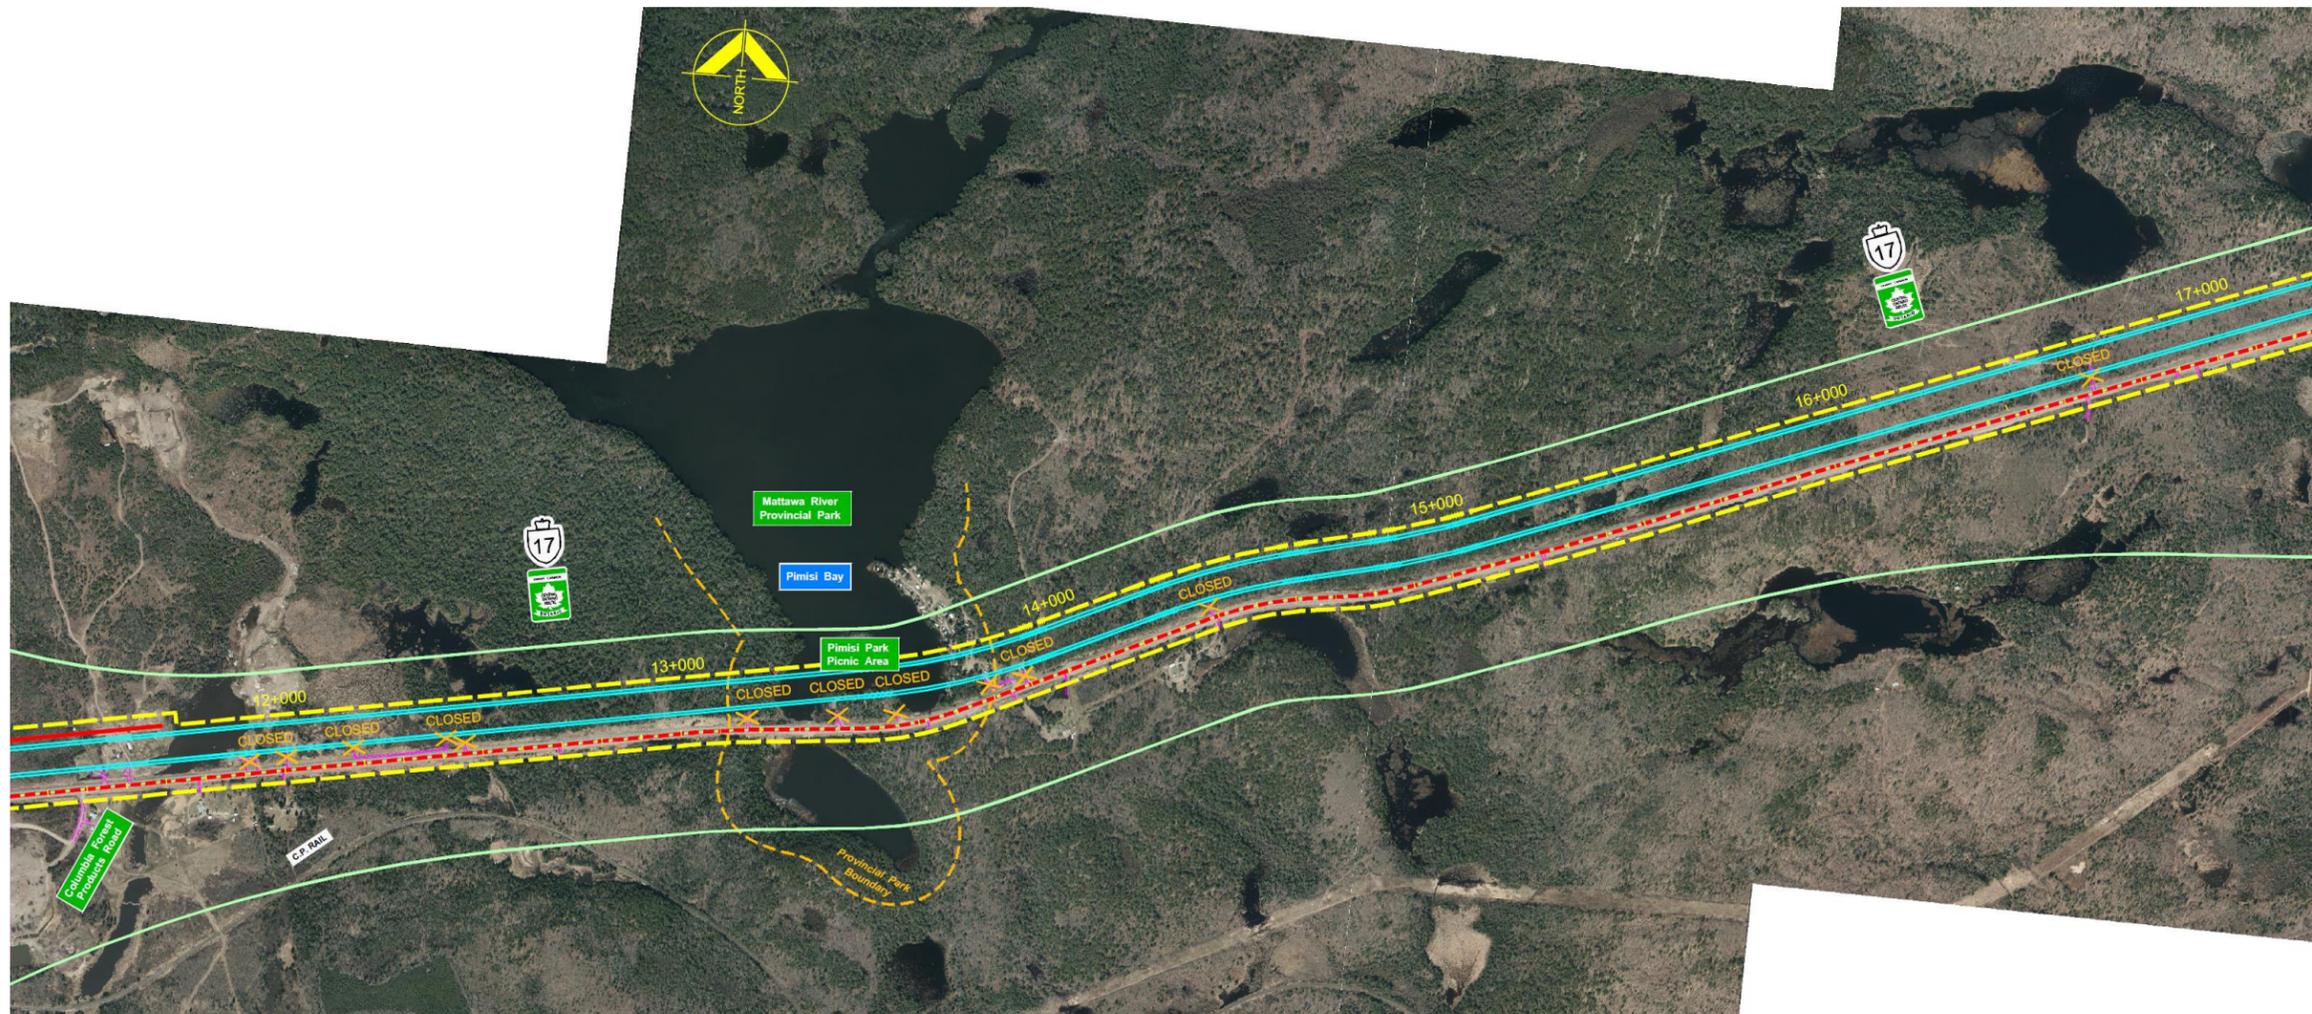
Alternative 2 Pimisi Bay Area - South Side Widening
